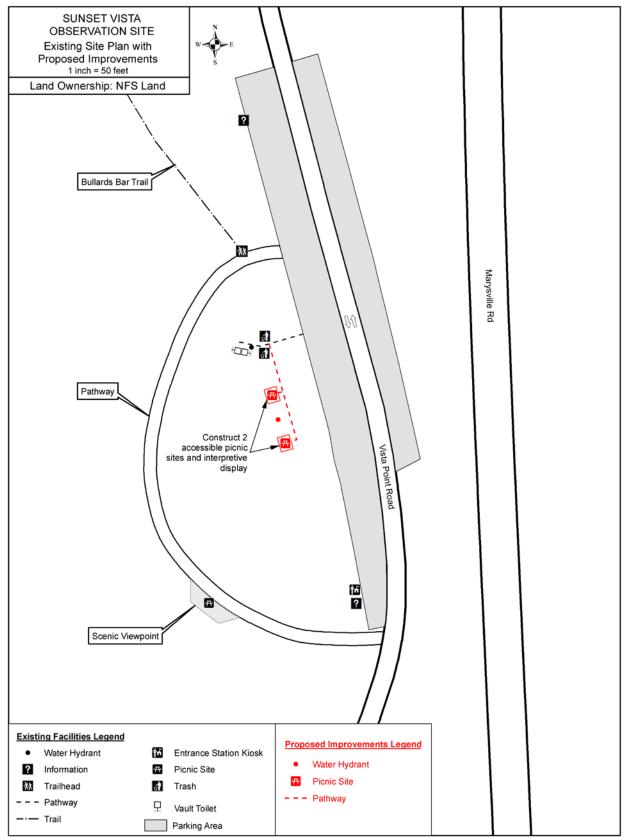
Existing site plan with proposed improvements for Sunset Vista Observation Site.
